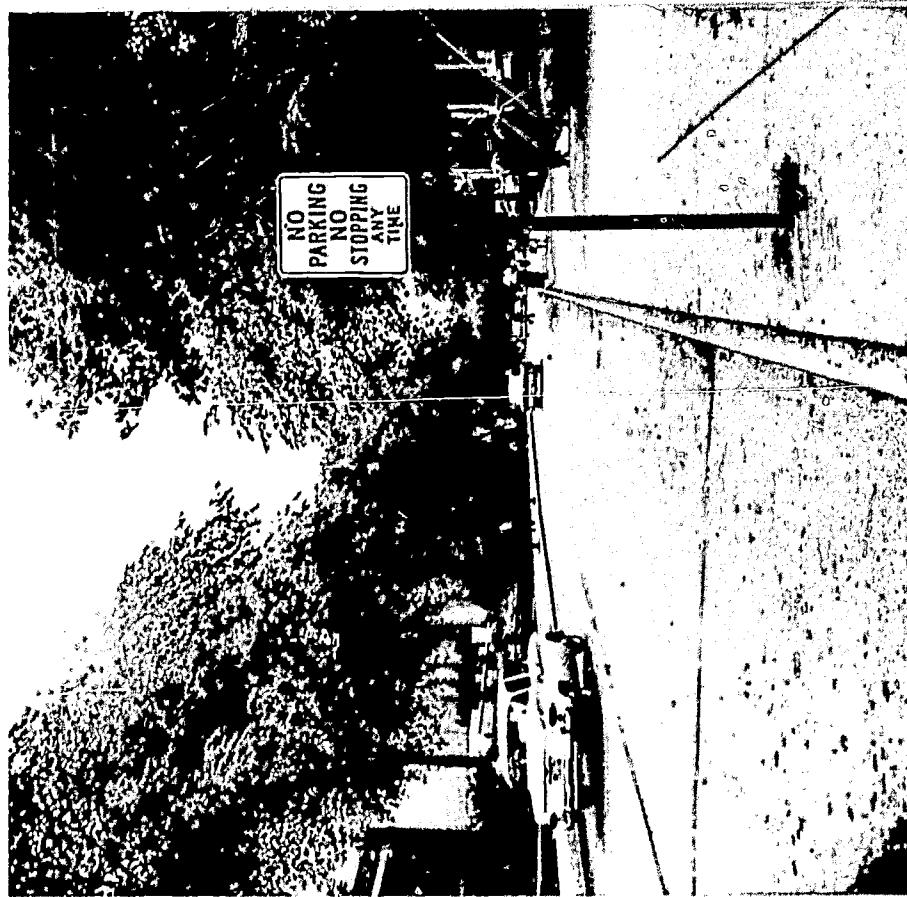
This is in front of the School of Law on 15th Avenue where cars have gone over the curb and sidewalk to park on the lawn causing damage to curb and sidewalk, lawn and shrubbery around the building.
